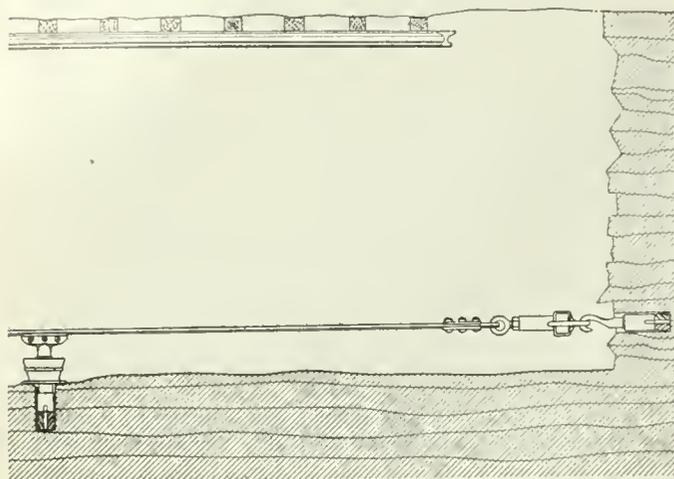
APPROVED METHOD OF DEAD ENDING TROLLEY WIRE
